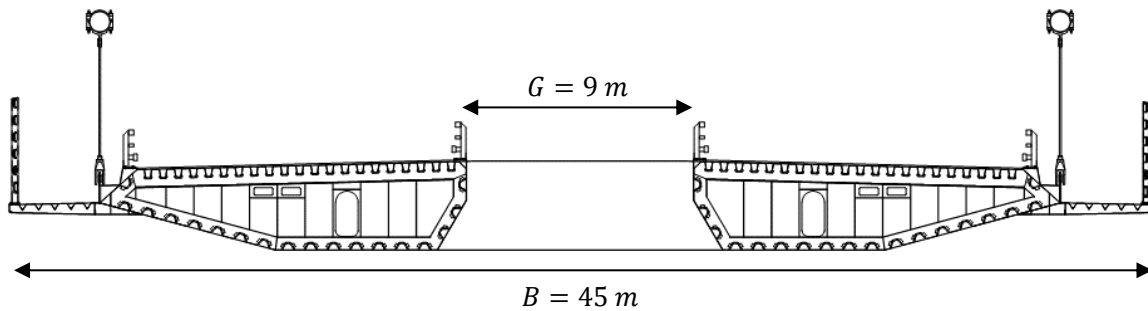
Twin-box deck cross section, 1915 Çanakkale Bridge.
